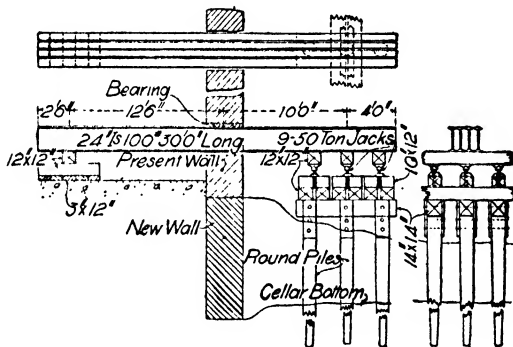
Underpinning with Needle-beams and Pile Bents.
